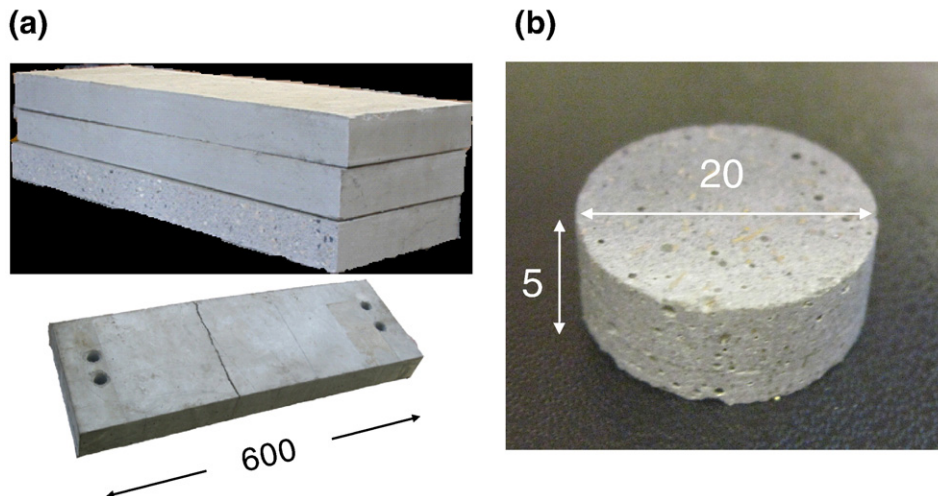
(a) UHPC plates, $50 \times 200 \times 600\text{ mm}$, from which samples were cored from; (b) photograph of one of the tested penny-shaped samples.
